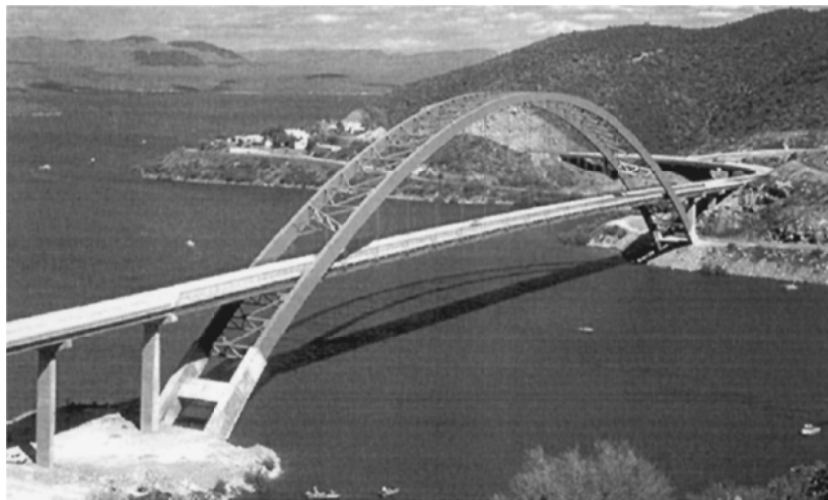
A typical arch bridge with the deck hanging on ties connected to the arch.
